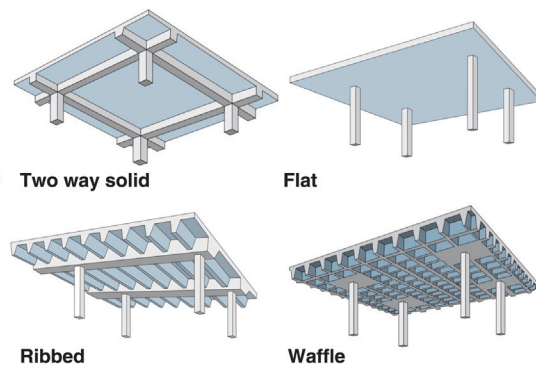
Conventional reinforced concrete floor types used in construction, comprising flat slab regions with or without downstand elements (image: MPA The Concrete Centre).
